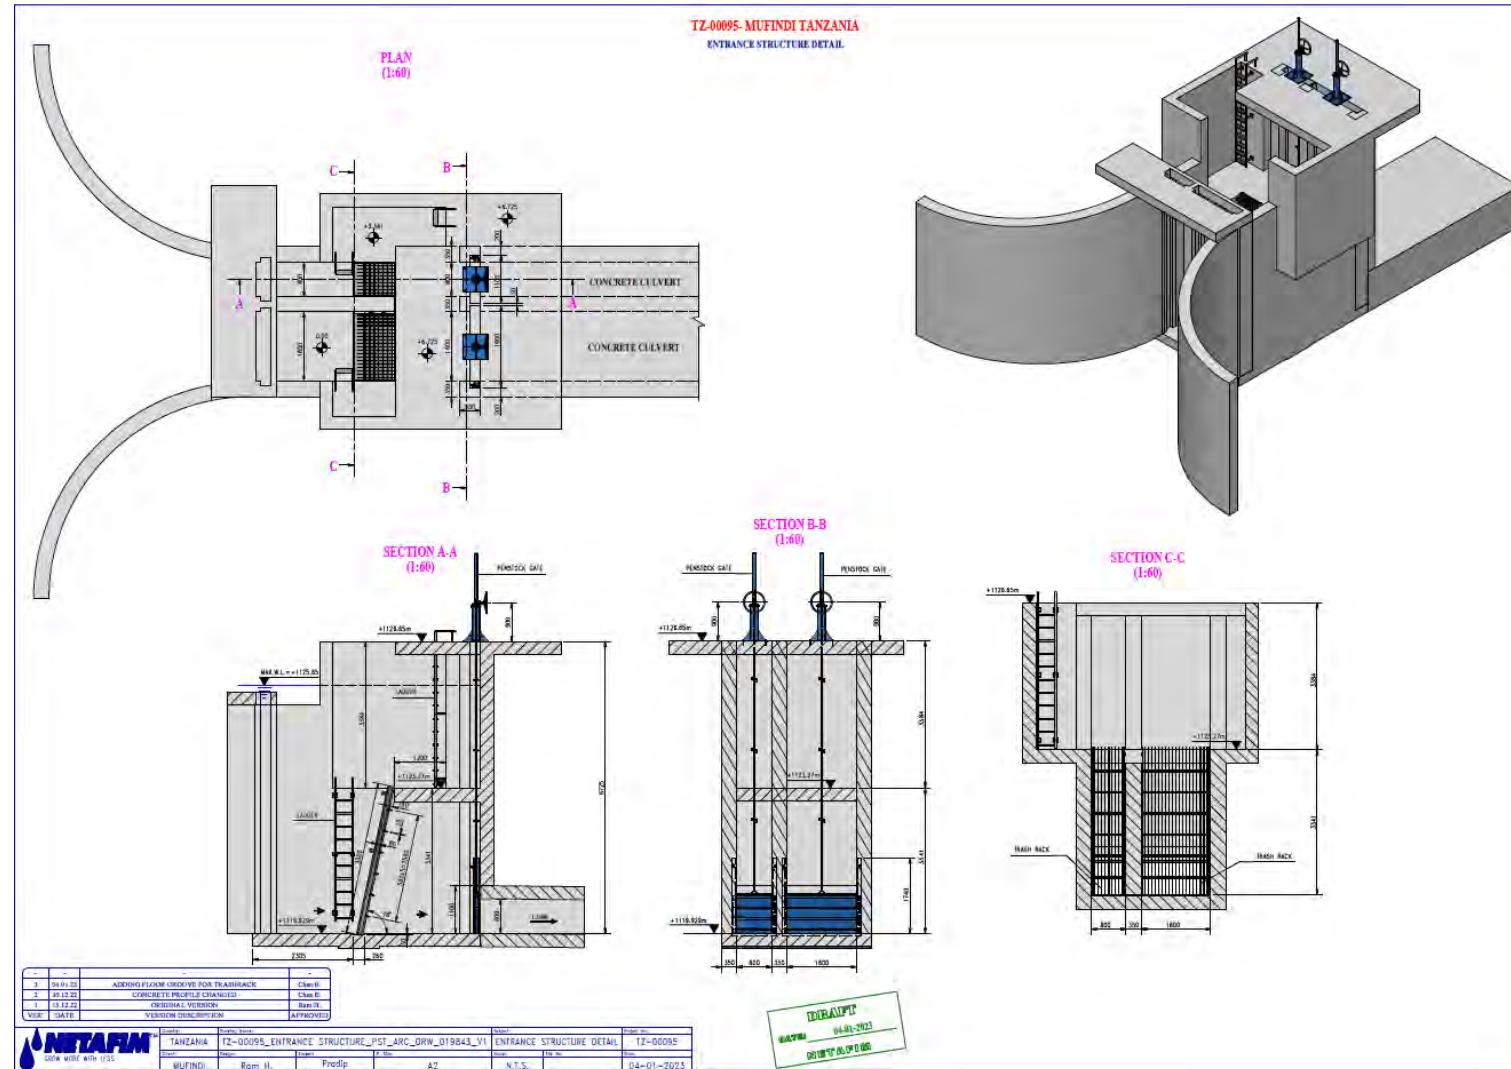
PRIMARY PUMPING STATION - CONCRETE
